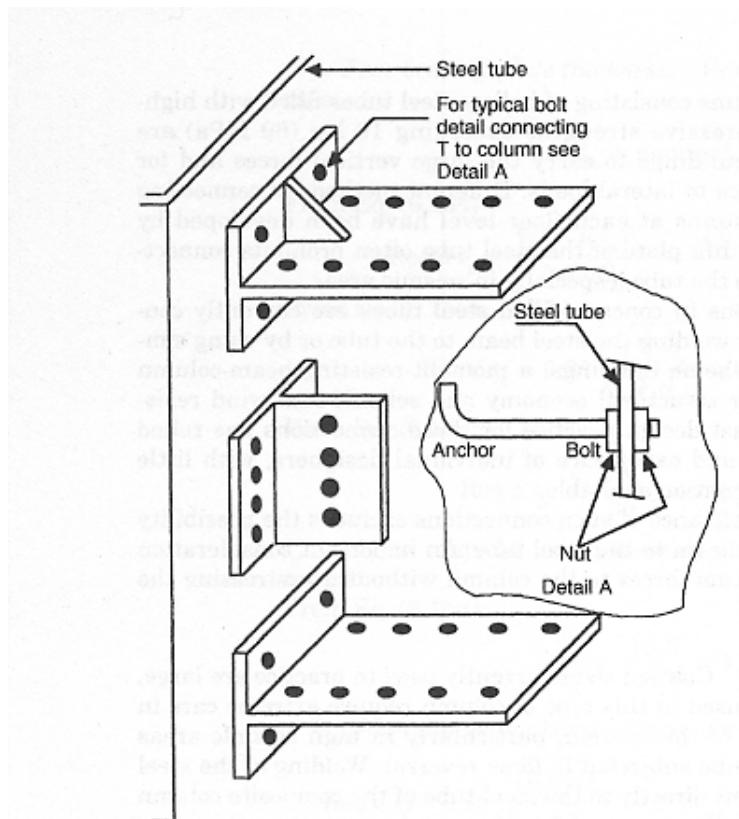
Type A connection with anchor bolt.¹⁸³
